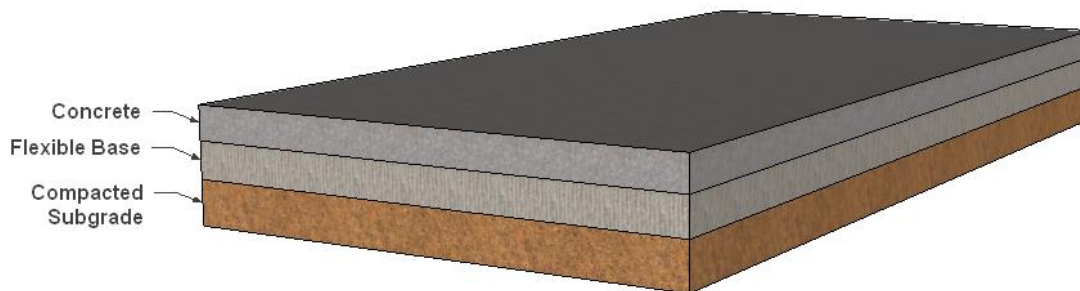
Option 2 Rigid Pavement Typical Section
